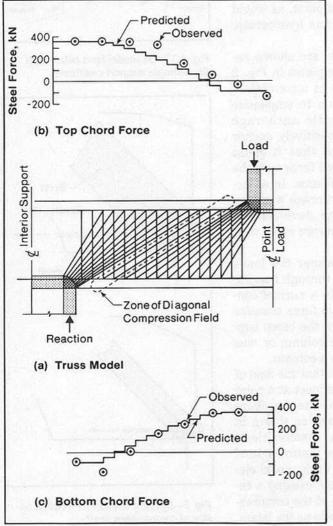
Truss model for interior shear span of a two-span continuous deep beam with heavy stirrup reinforcement.
